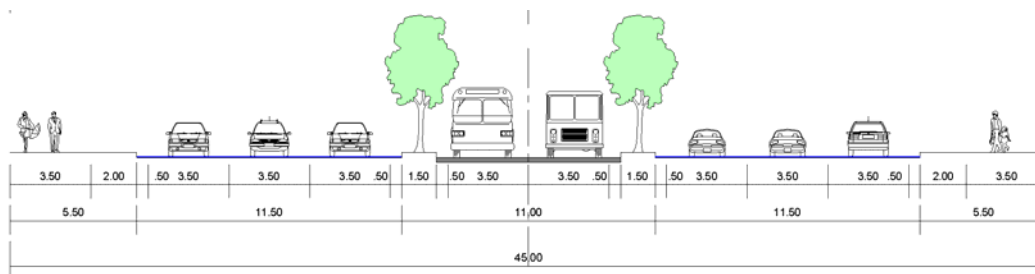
Planned Cross Section of Av. Augusto Montenegro
